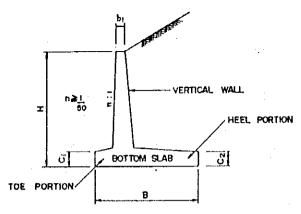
Configuration of T-Shaped Retaining Wall
